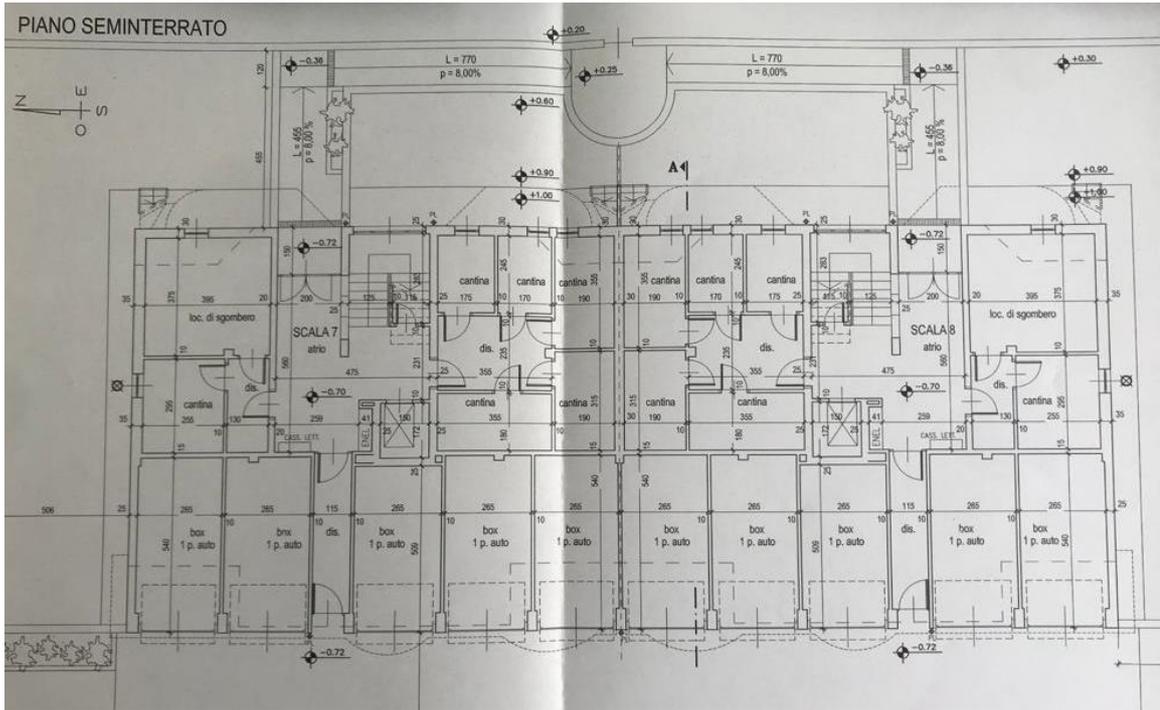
Basement Floor Plan (Via S. Francesco da Paola 5)
